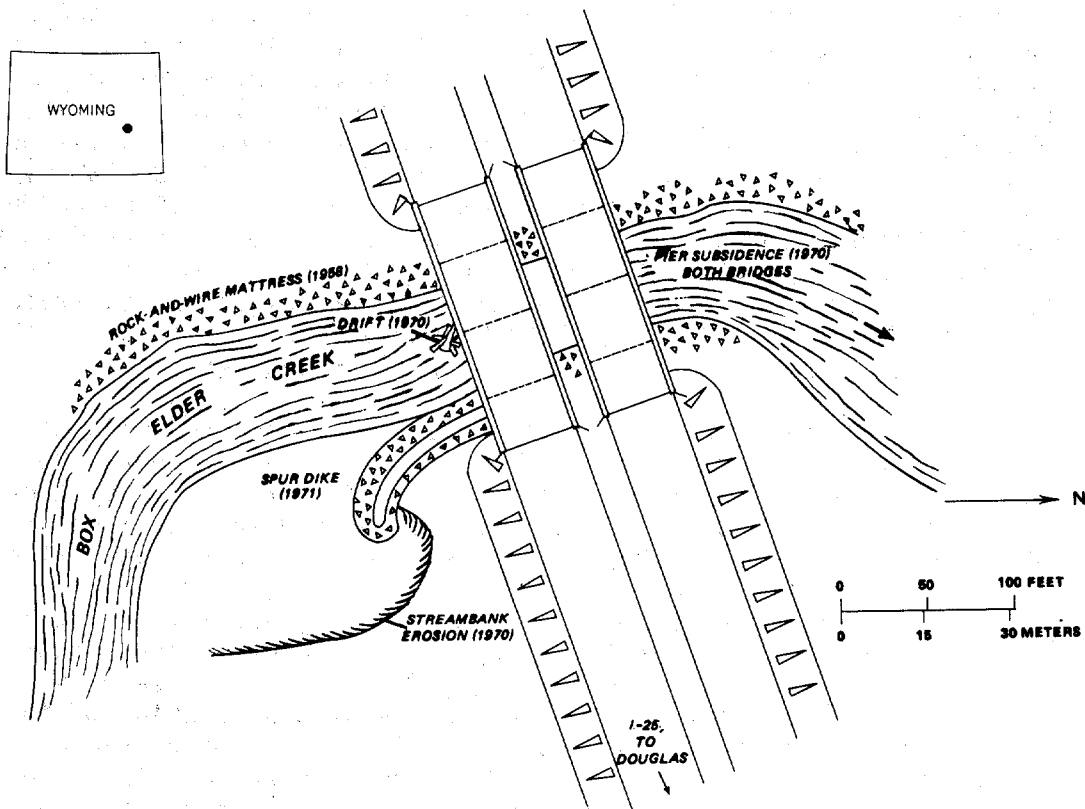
Plan sketch of I-25 bridge at Box Elder Creek.
